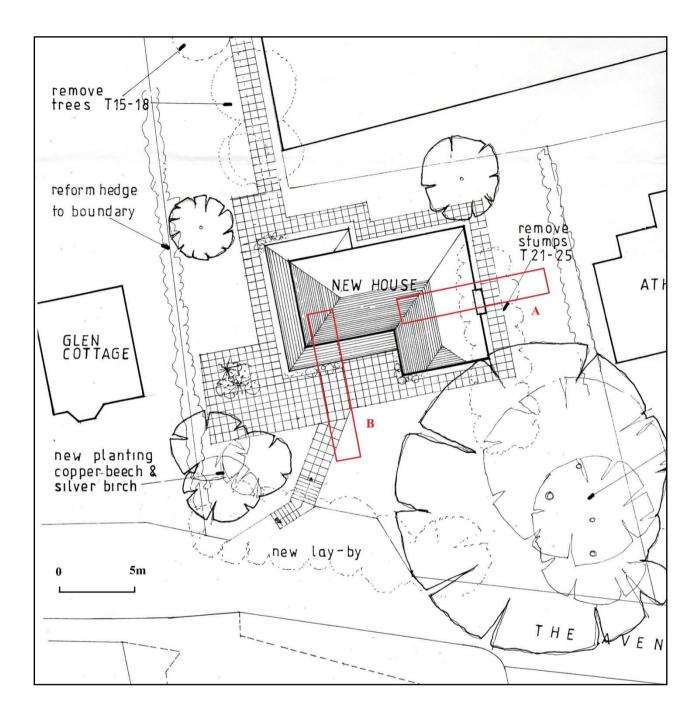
Land Adjacent to Atherden, Mayfield: Development plan showing location of proposed evaluation trenches (Adapted from architects plan)
